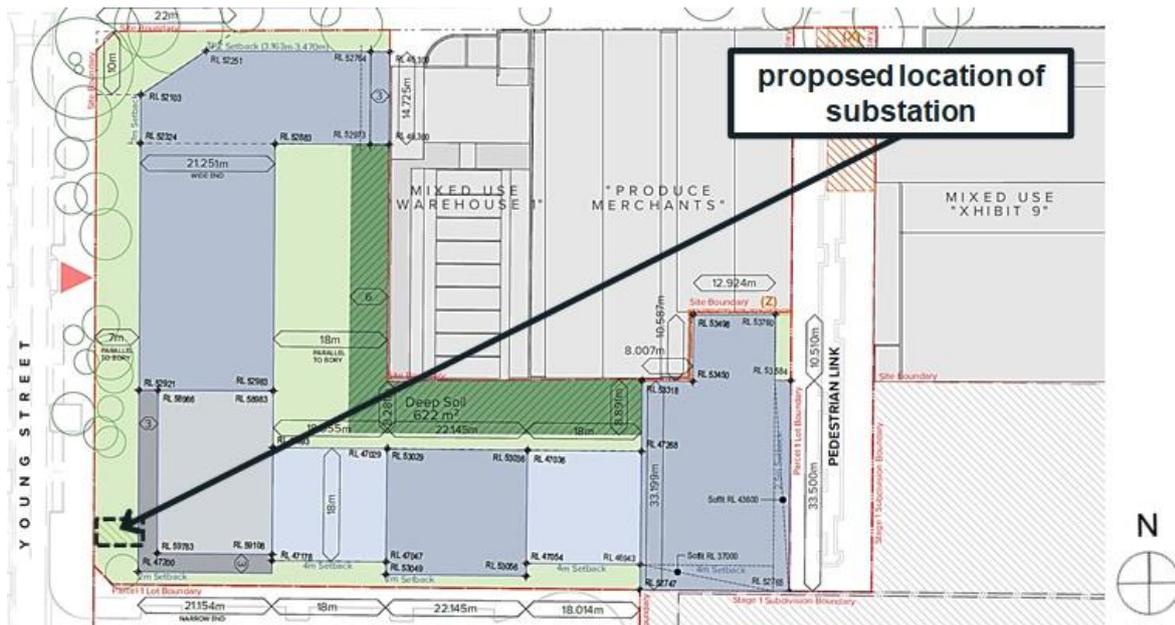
Proposed location of substation within proposed new (Parcel 1) Lot 1
